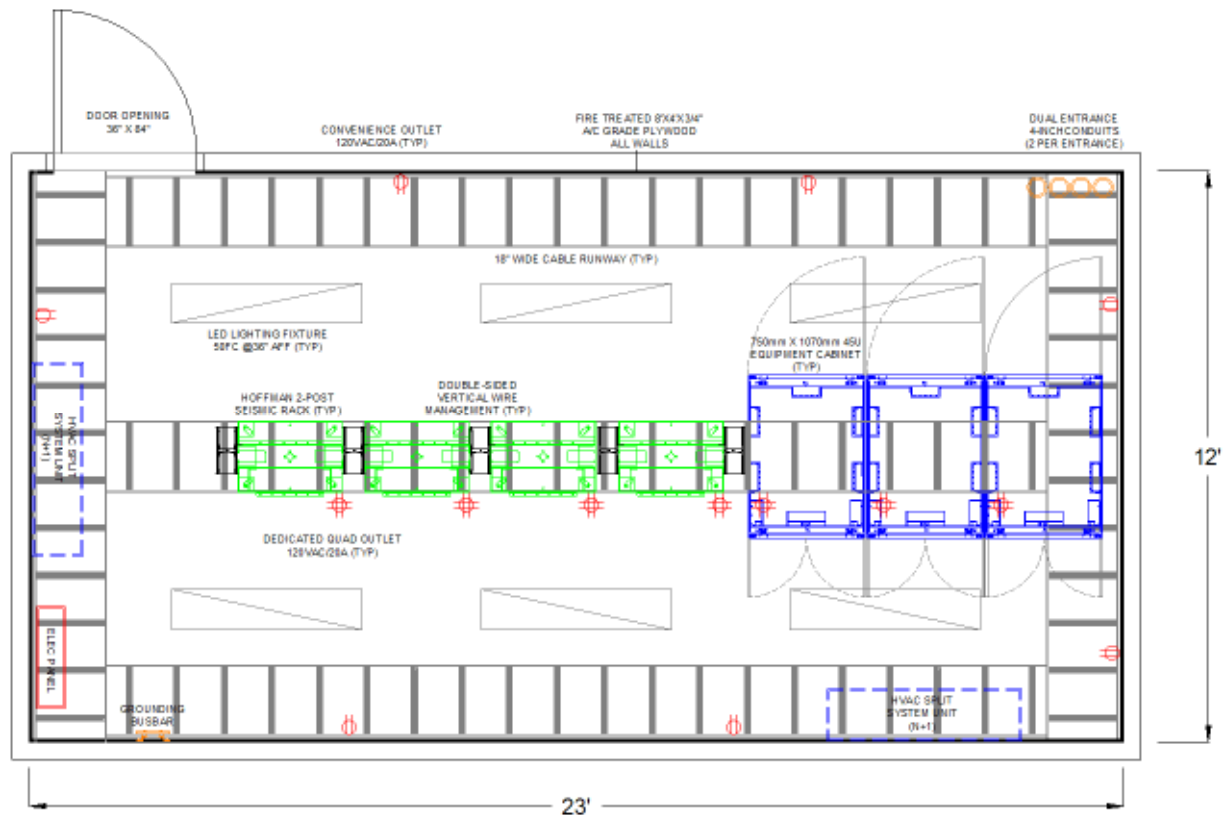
(a): Typical BDF Room Layout
